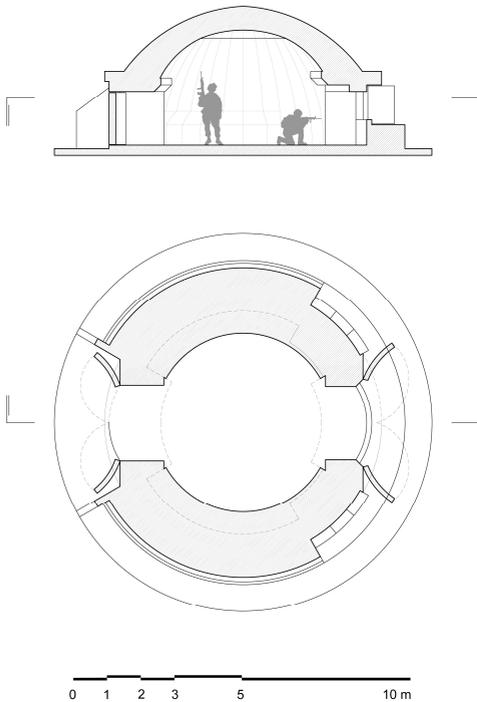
Plan and section drawings based on survey documentation of a typical medium scale bunker (Authors).
